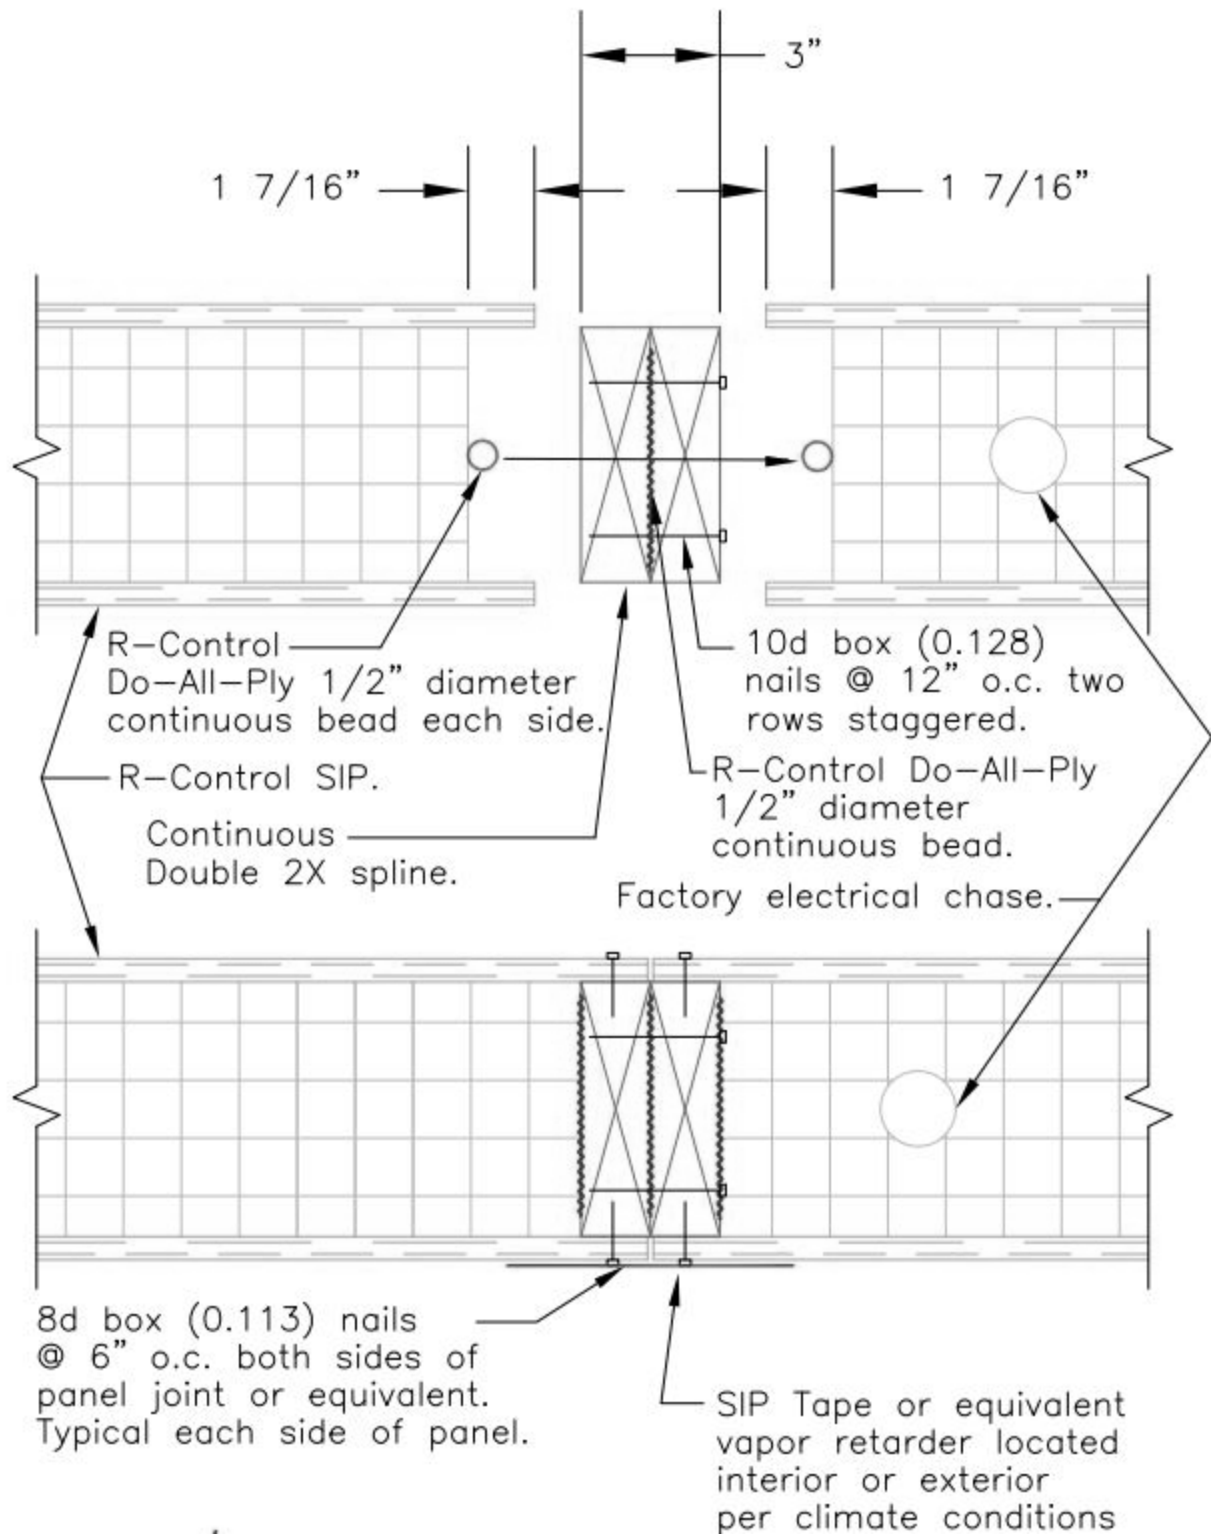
Foam Cutout + Dimensional Lumber Wall Connection Method
